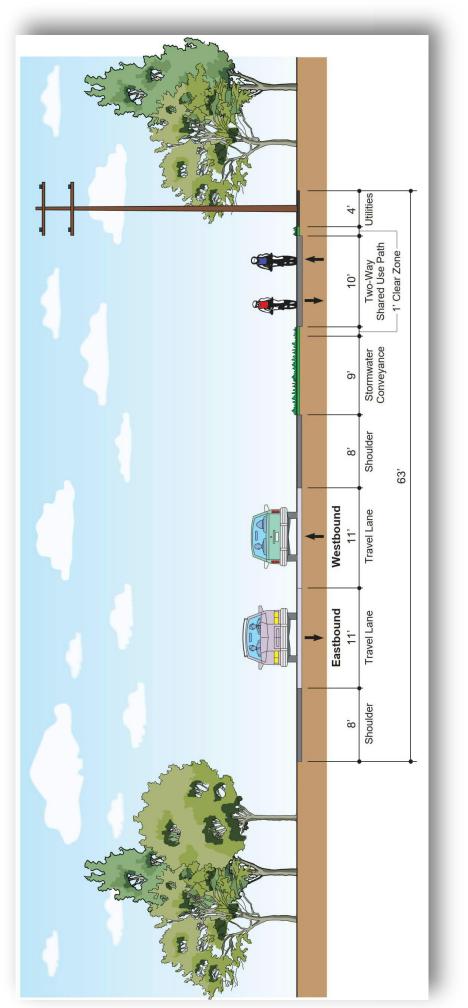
Conceptual Improvements - Conway Road Typical Section with 8-foot Shoulders & 10-foot Shared Use Path
